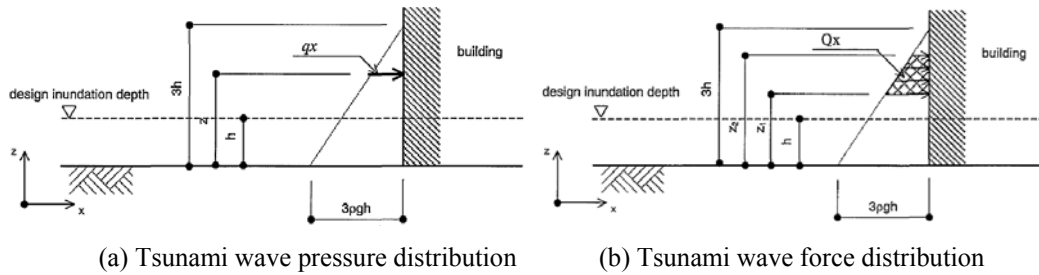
Tsunami wave pressure and force act on a building (Okada et al., 2005)
